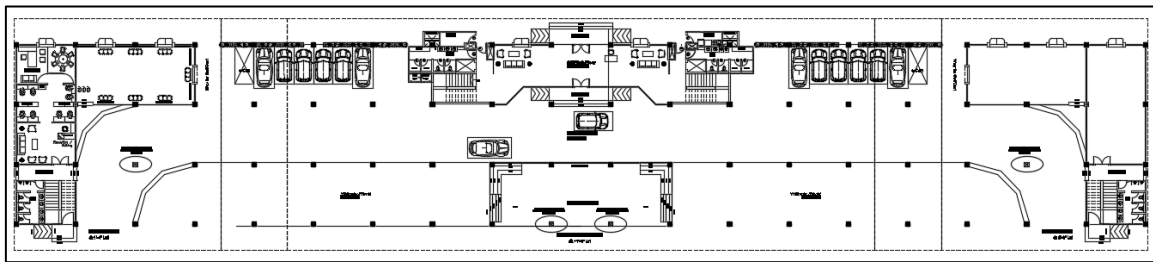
Stilt Floor Plan – Showing Vehicular Movement, LHS & RHS Building
